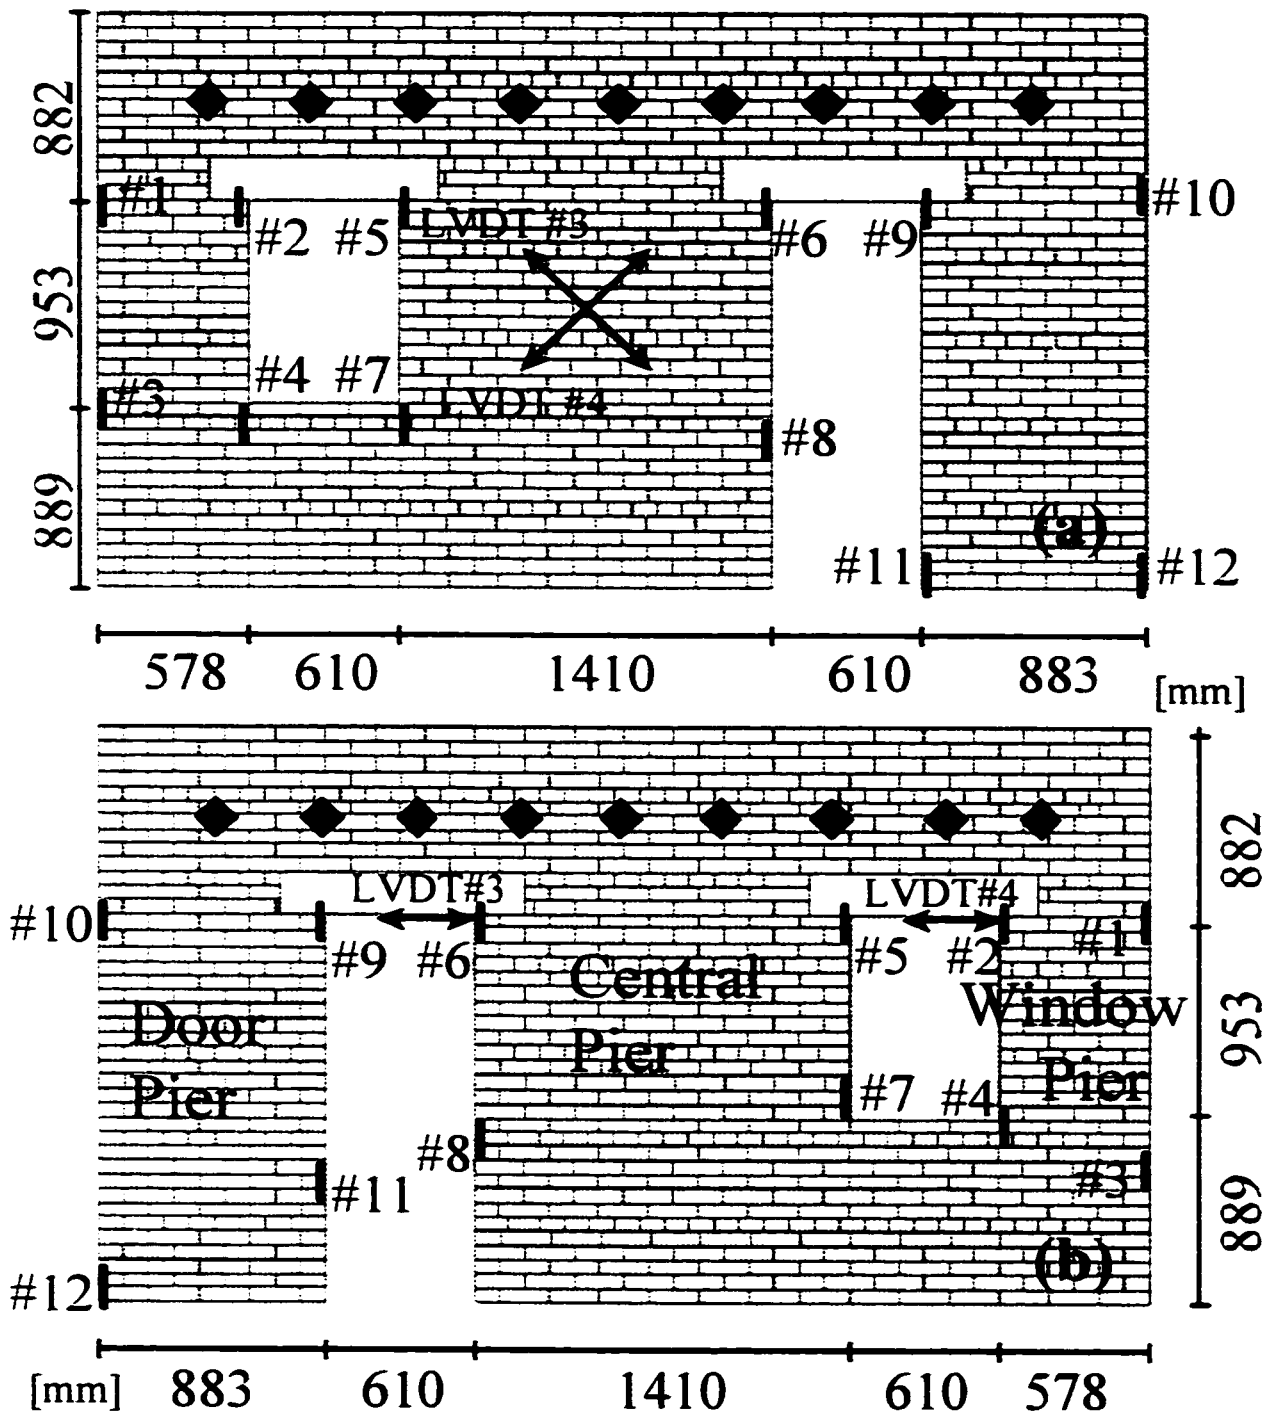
Location of LVDTs and clip gages: (a) West wall elevation; (b) East wall elevation.
